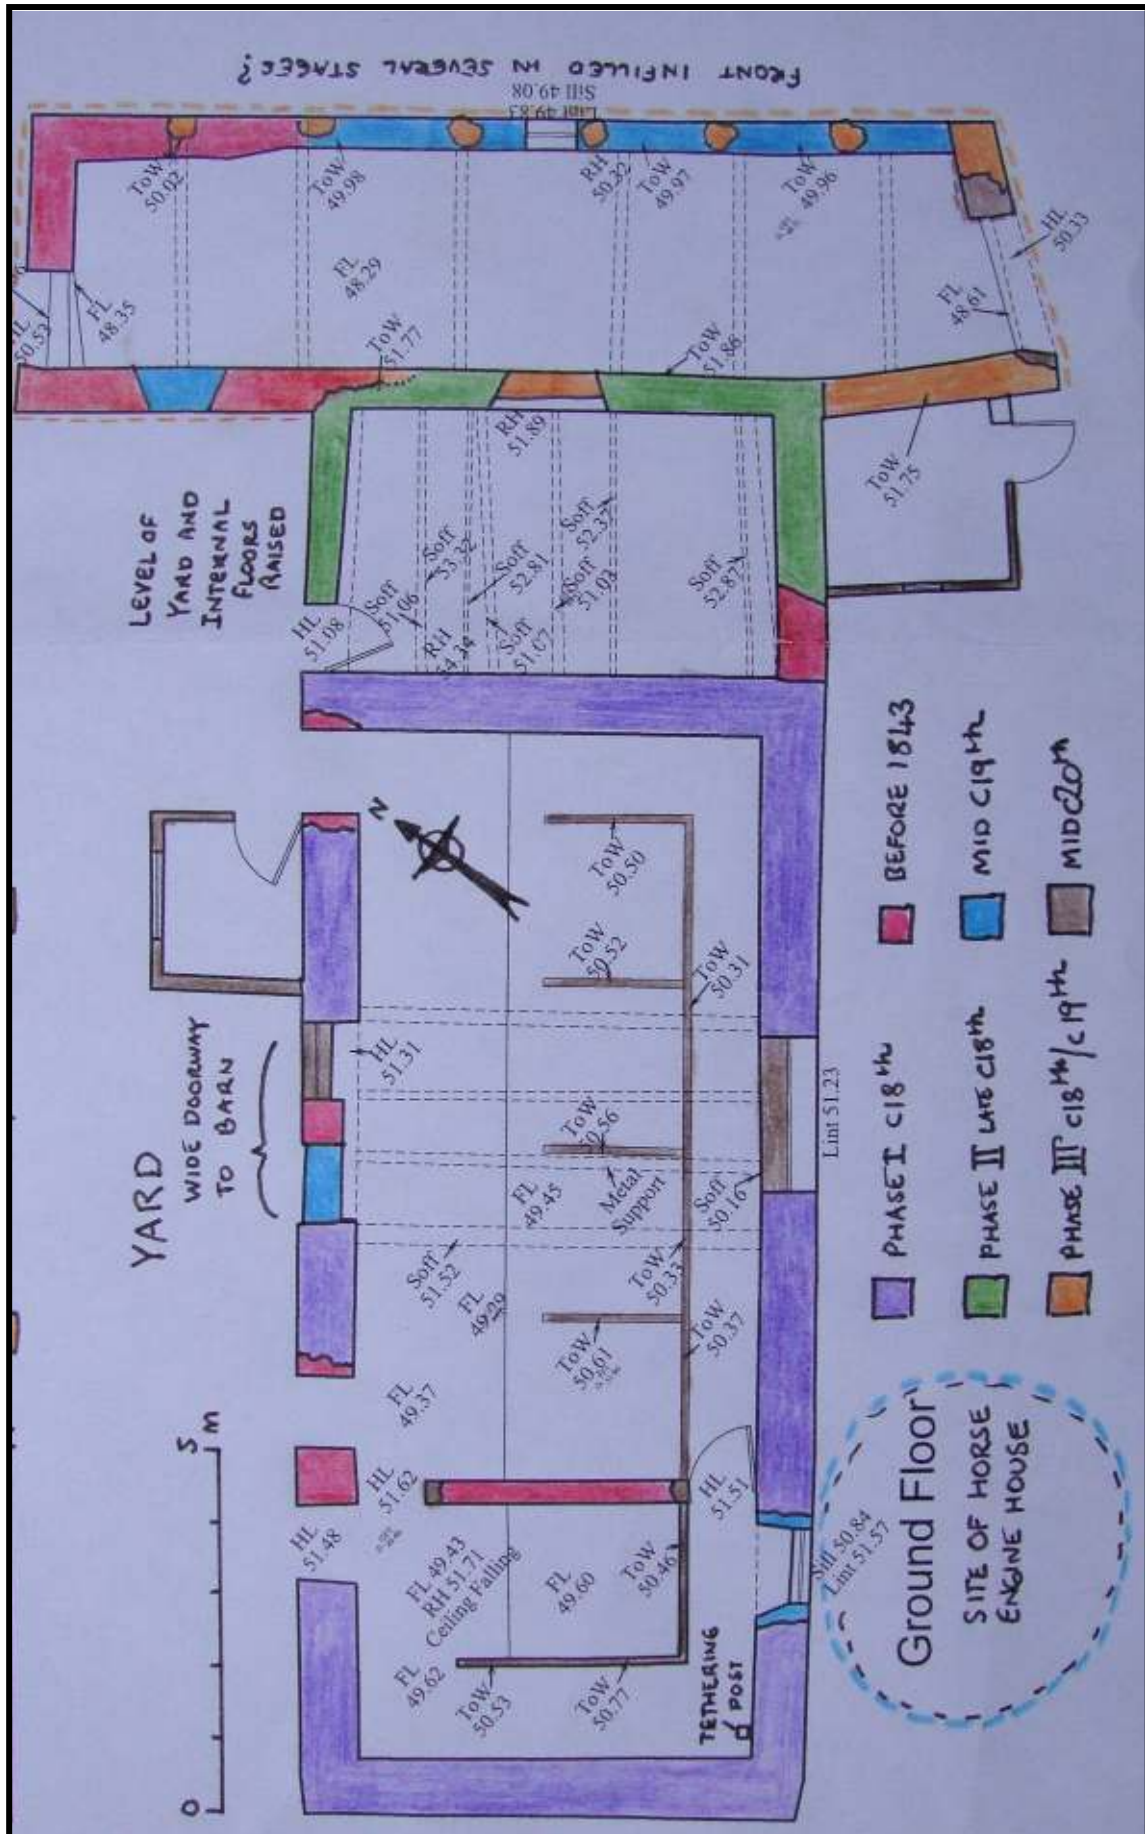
Plan at ground-floor level showing suggested phasing. Based on drawings by DMR Design
